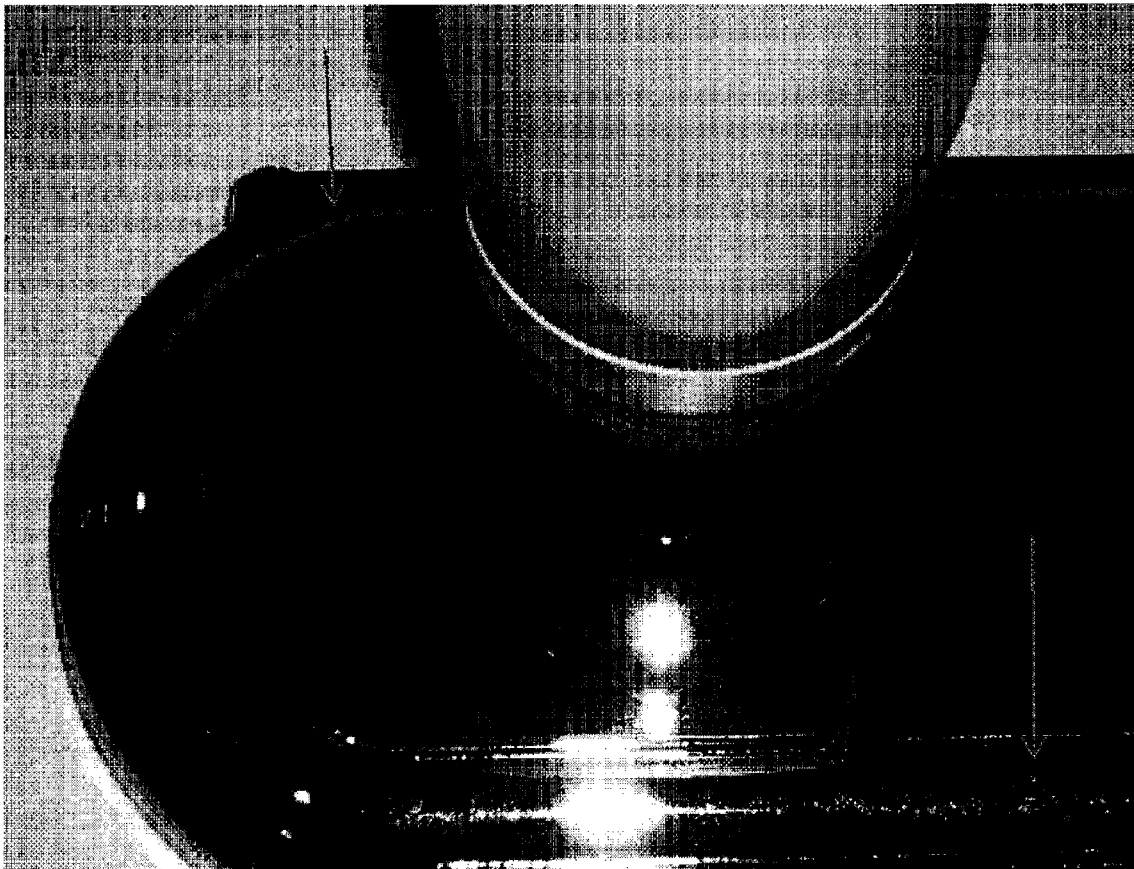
shows pitting on the mirrored light fixture in the master bathroom.
